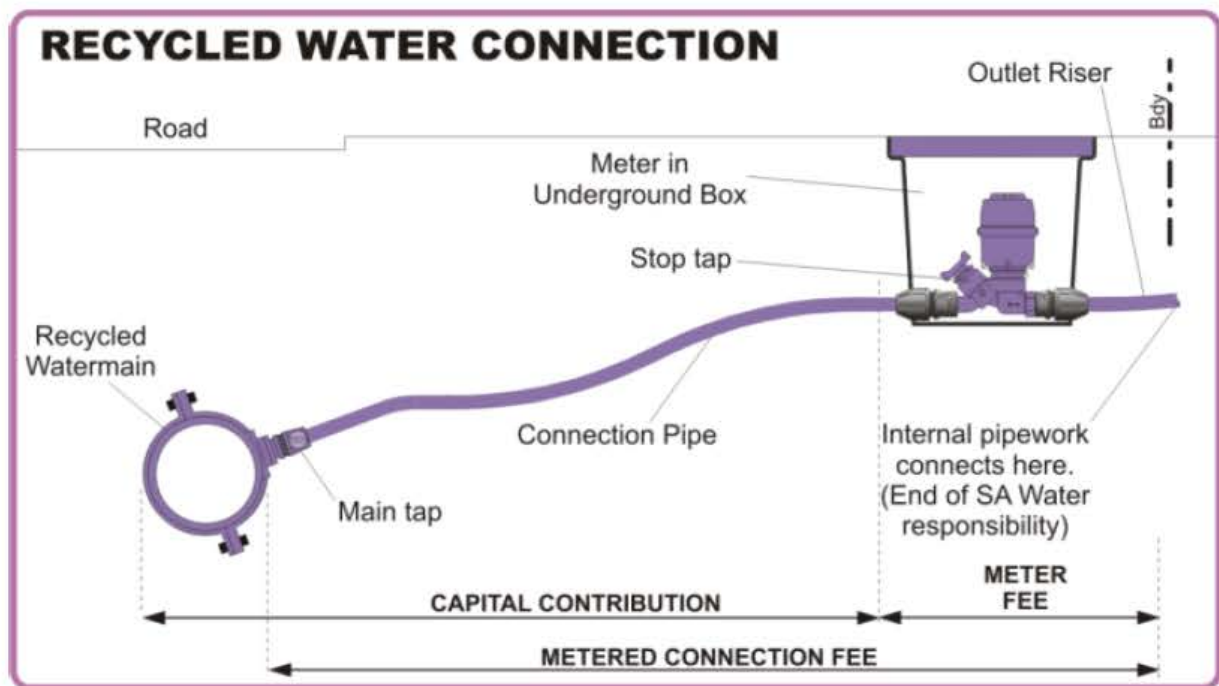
Typical non-drinking water meter below ground installations (Source – SA Water Metered Recycled Water Connection Fact Sheet)
